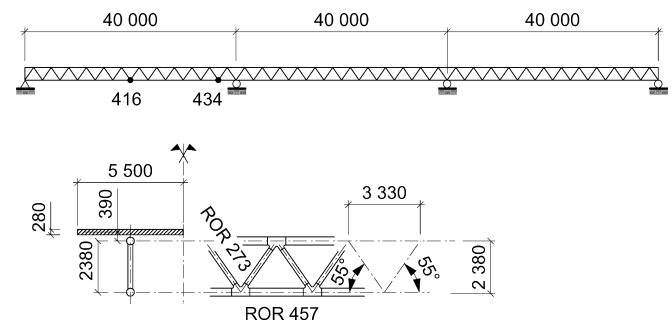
Geometry and structural model of the typical tubular truss bridge (dimensions in mm).
